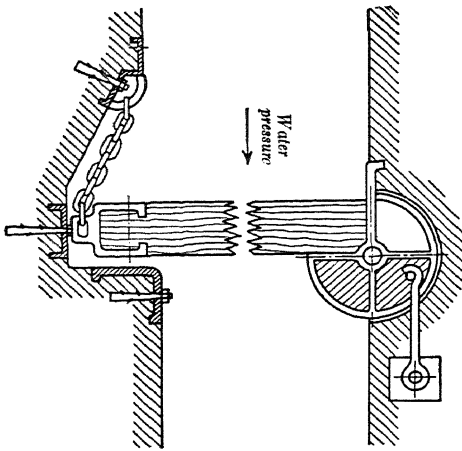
Stop-log weir provided with a revolving column for rapid opening
